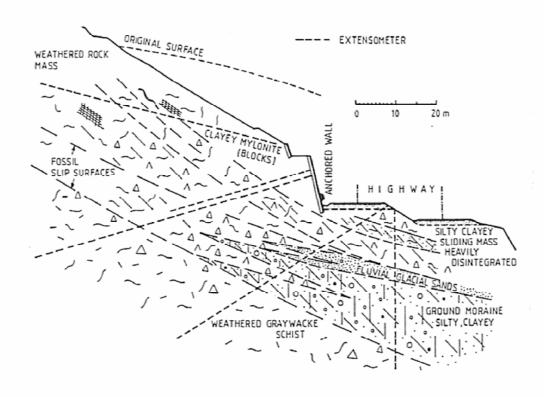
Ground profile showing location of anchored wall and highway (from Hanna, 1982)
